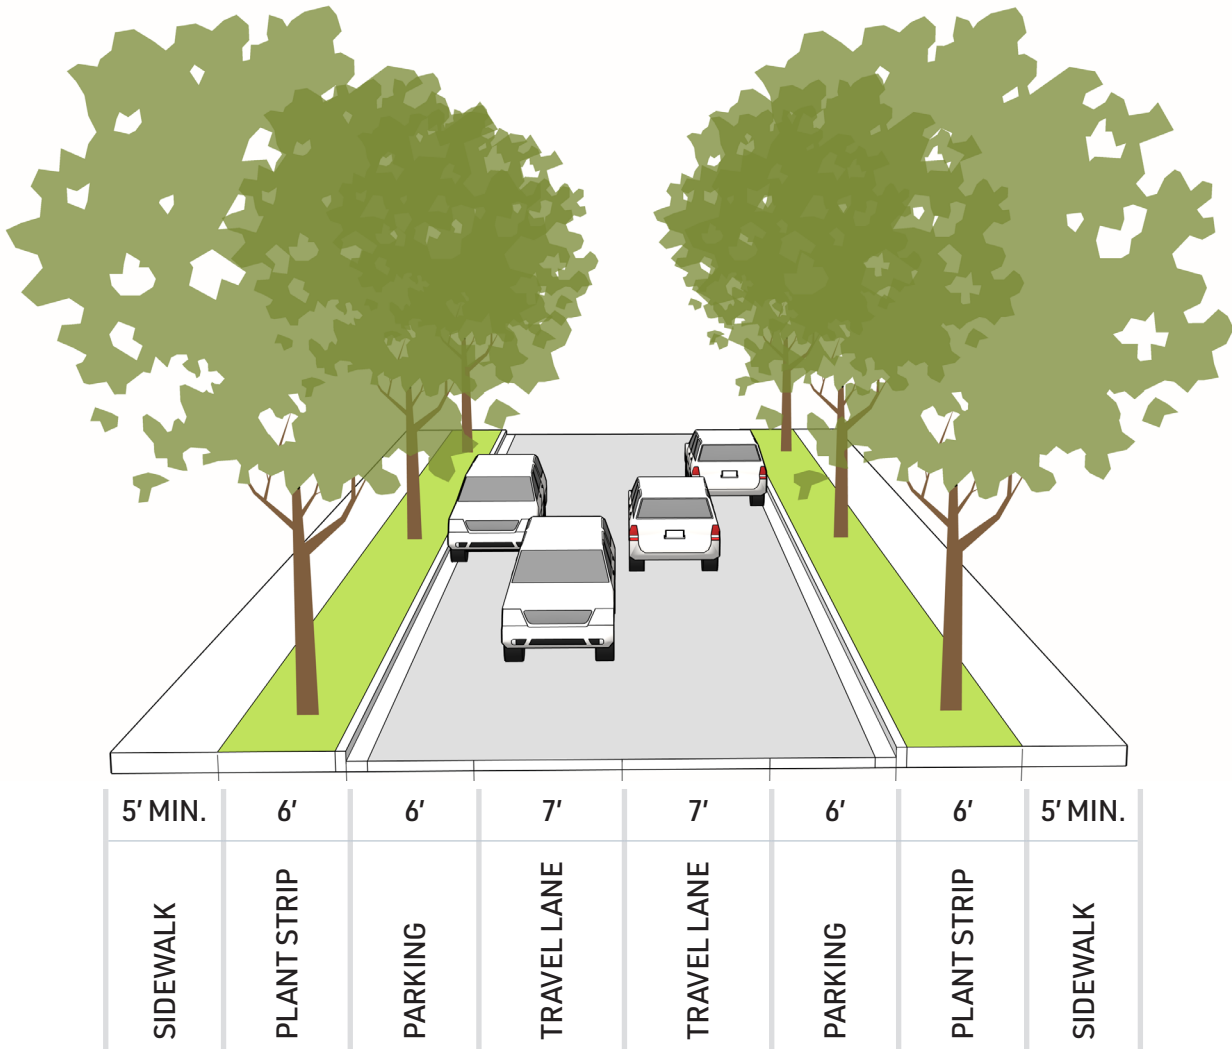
XX - 01 - Residential Street Connectivity, Blocks, and Accessways
